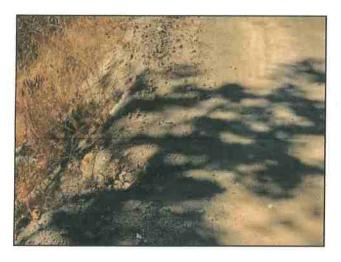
River Rd Looking @ Erosion Issue From Lack of Functioning Culvert
